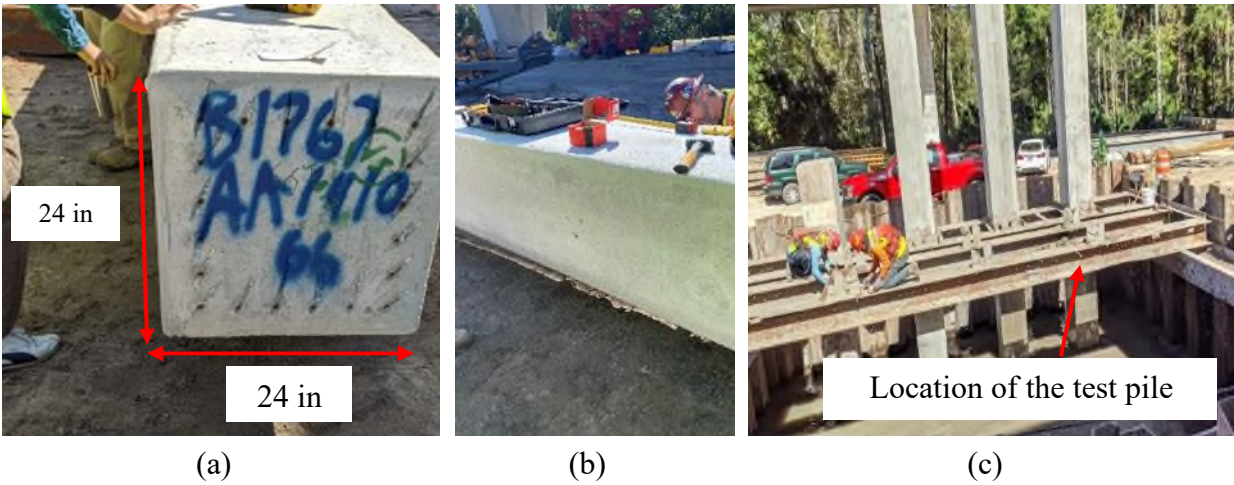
Conditions prior to pile driving process: (a) prestressed concrete test pile cross-section, (b) accelerometer installation for PDA test, and (c) cofferdam built around pier 5 at Site B.
